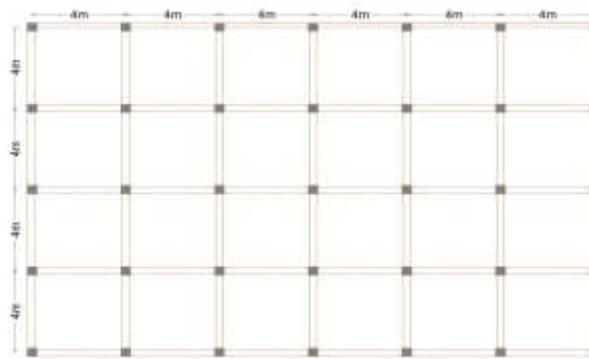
Plan of three, seven, and twenty two-storey regular RC buildings (all dimensions are in m)
